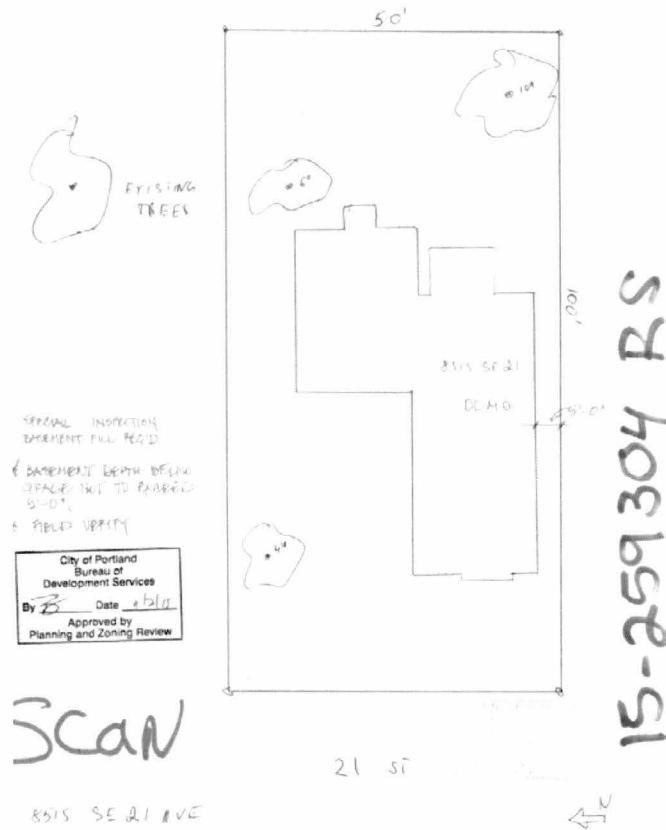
Address 8515 SE 21st Ave. hand sketched site plan including footprint of existing building to be demolished.
